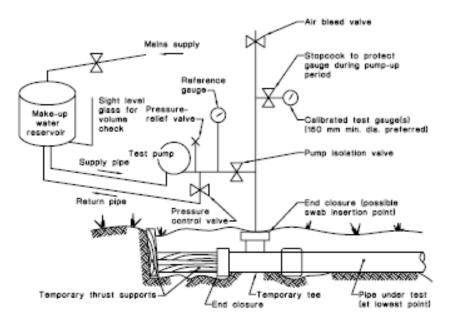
TYPICAL FIELD PRESSURE TEST EQUIPMENT LAYOUT
